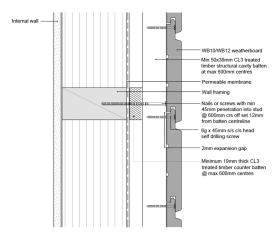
WB10/ WB12 Vertical fixing detail-birds eye
